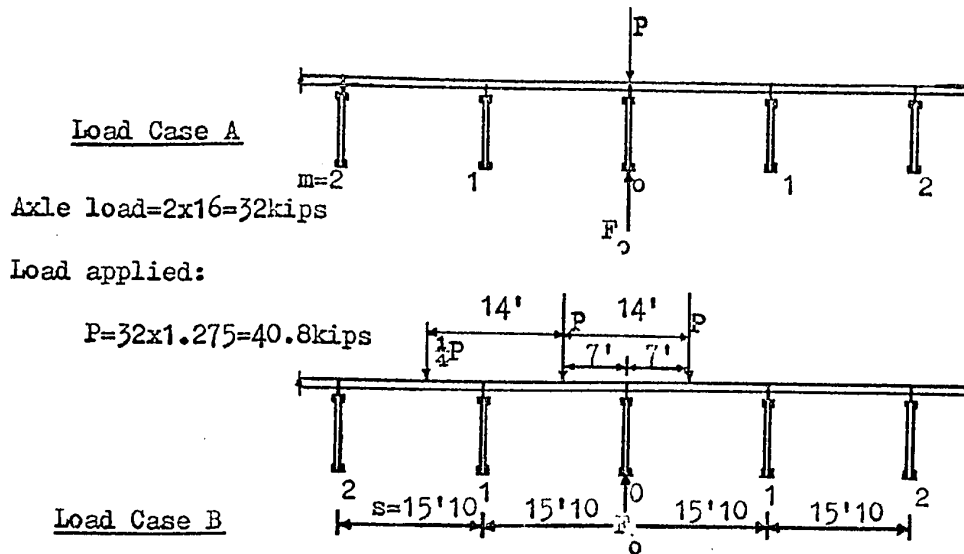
MAXIMUM LOAD, F_o , ON A FLOOR BEAM DUE TO ONE H20-S16 TRUCK
